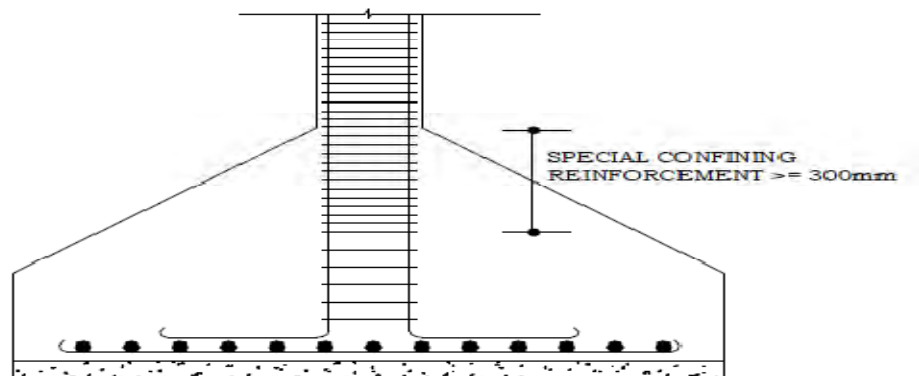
Provision of Special Confining Reinforcement in Footing (IS 13920 – 1993)
